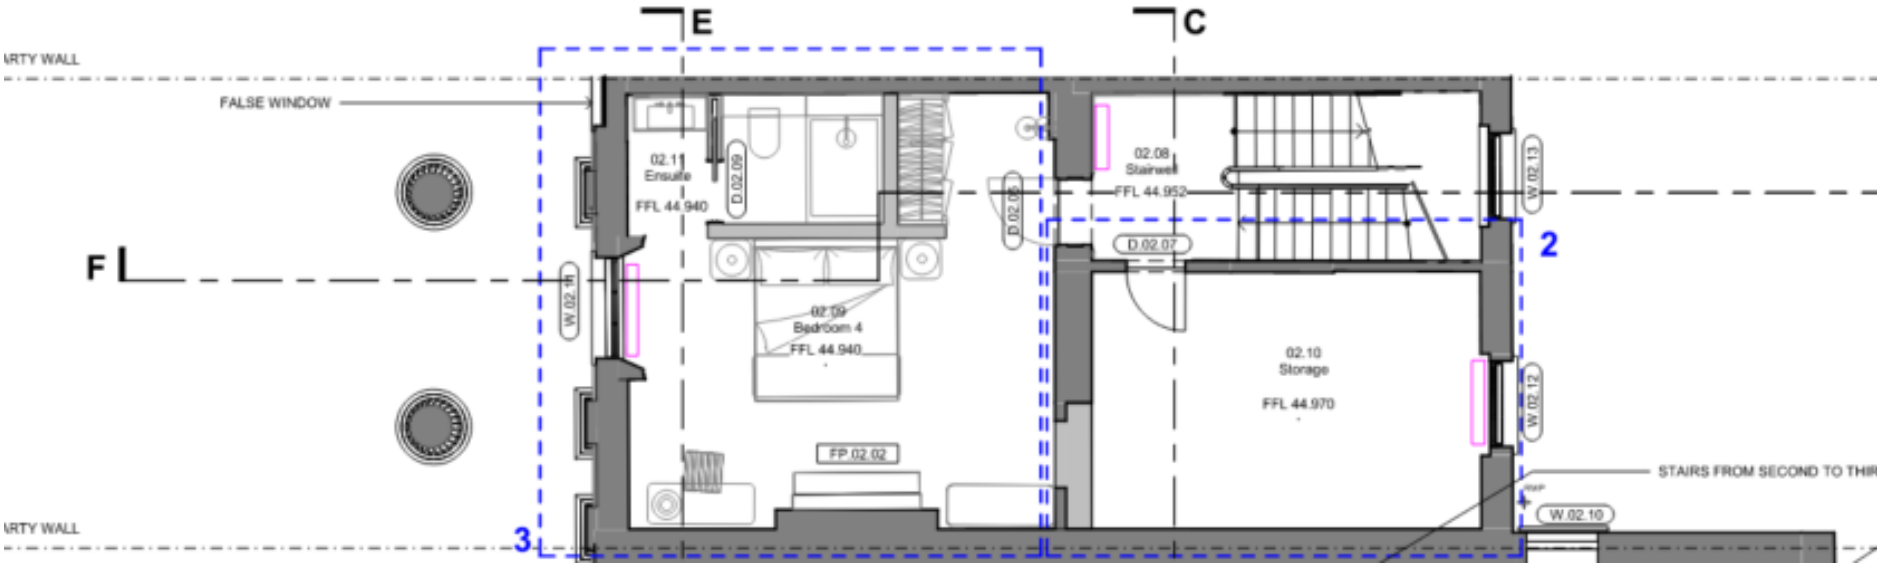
Extract from proposed 2<sup>nd</sup> floor plan of no. 2 showing new pod bathroom
